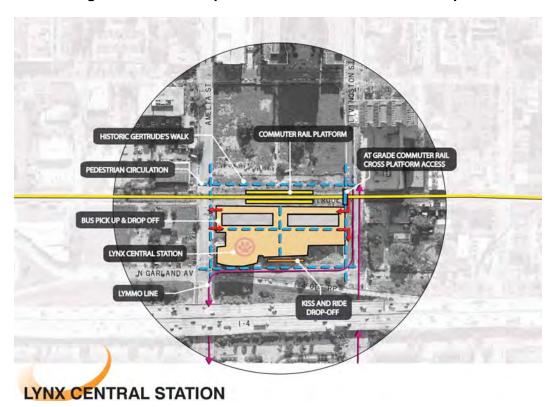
Conceptual Station Site Plan – LYNX Central Station
